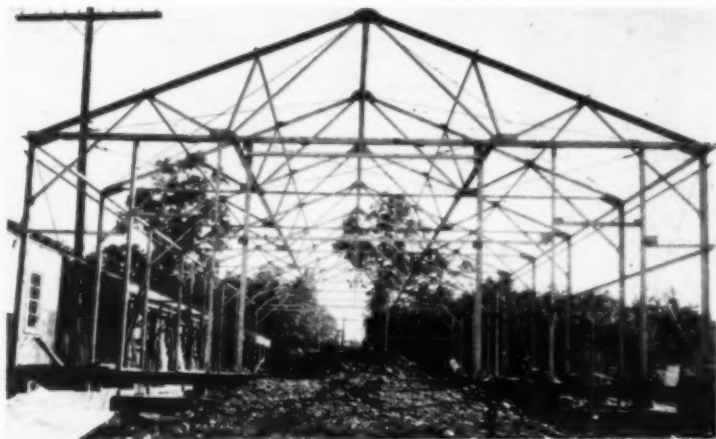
8 A.M., SECOND DAY—Structural frame of building has been erected, using bolted field connections, preparatory to placing sheathing on walls and roof.
